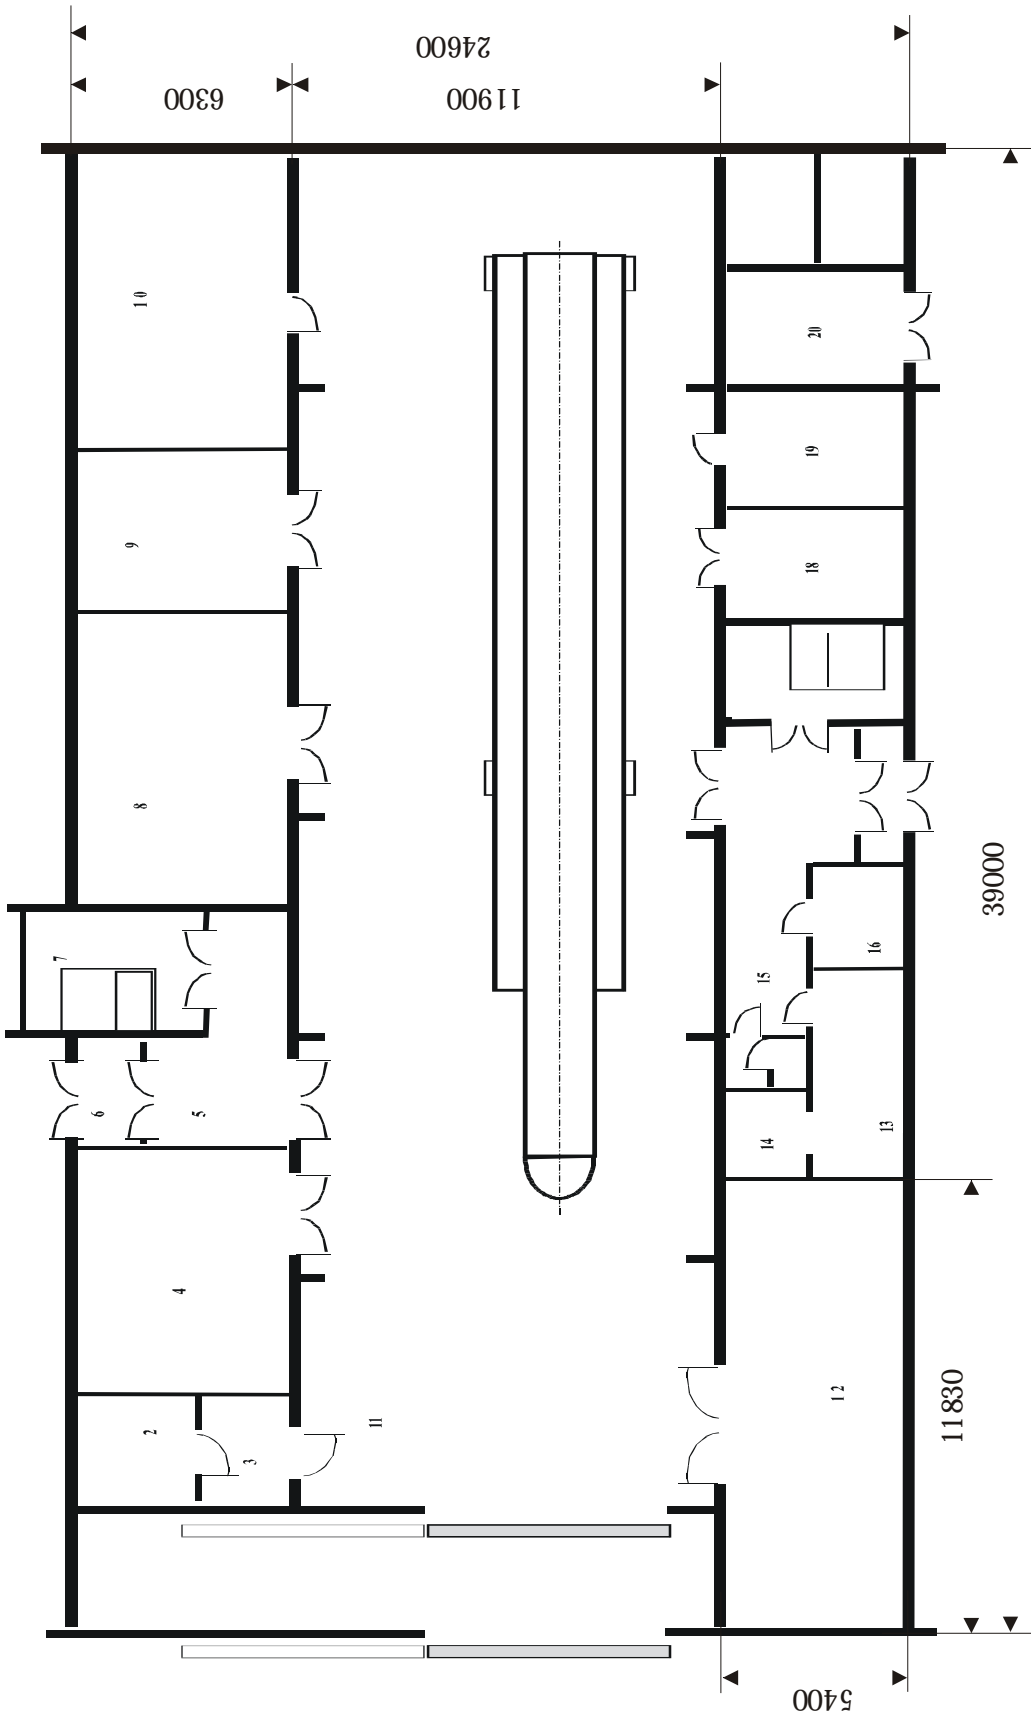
Launch Vehicle Assembly and Test Building Layout
